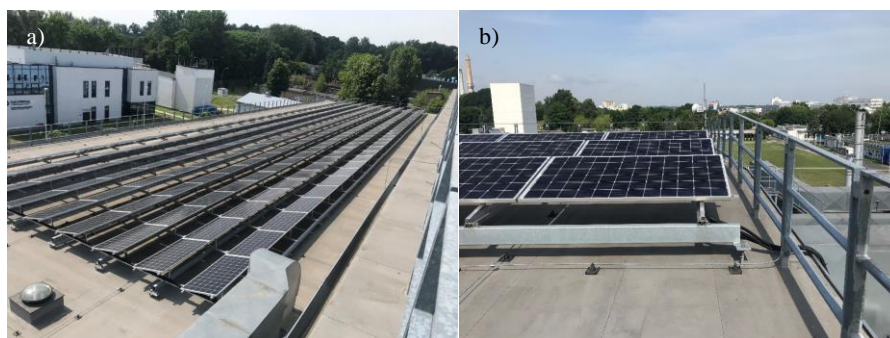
Roof of building F20 after the modernisation and installation of photovoltaic panels, a) side aisle, b) central aisle
